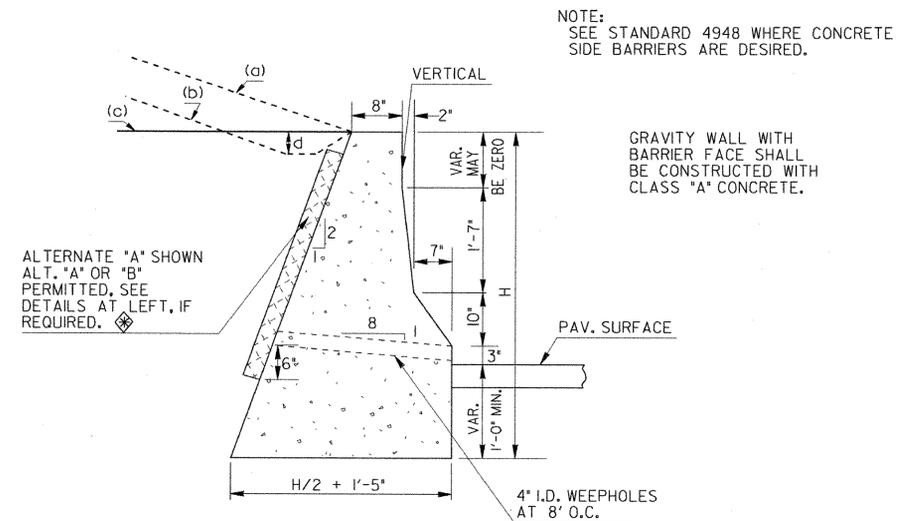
DETAILS OF RETAINING WALL TYPICAL SECTIONS
